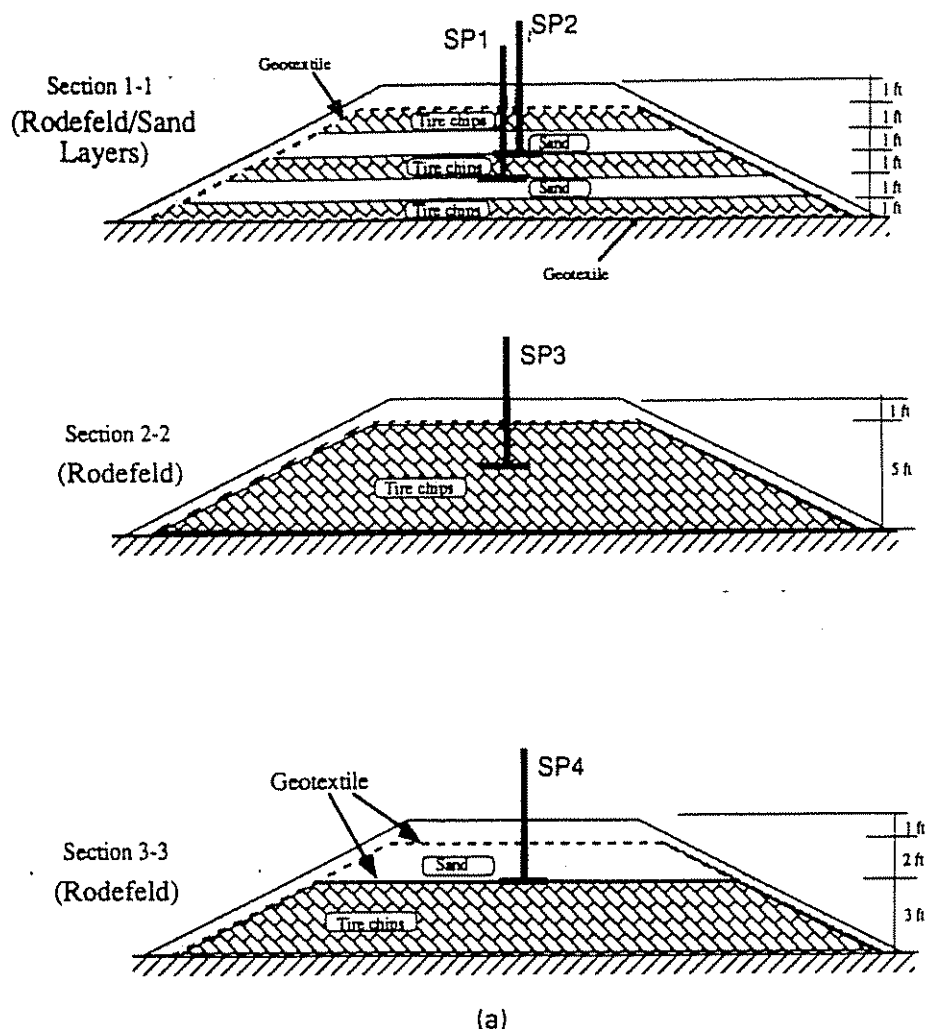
Elevation view of test embankment sections as designed: (a), Sections 1, 2, and 3; (b), Sections 4, 5, and 6. (continued on next page)
